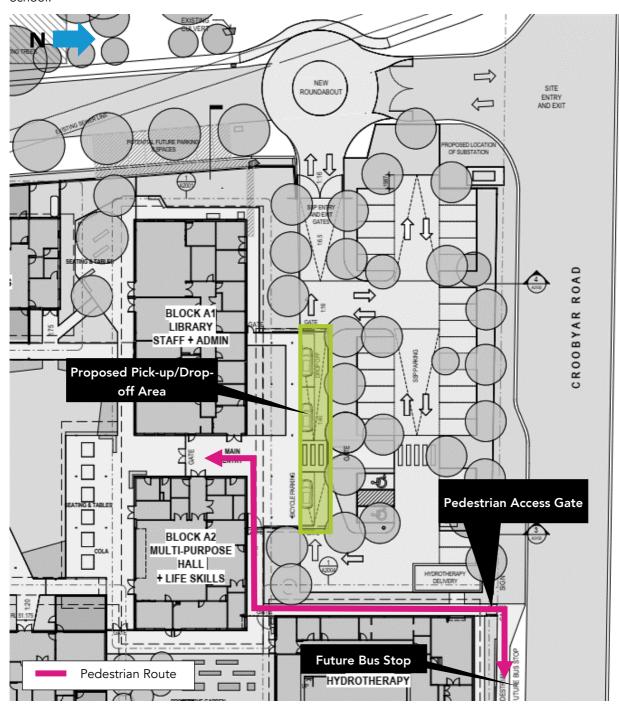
Proposed Site Layout - Site Plan, Drawing No. A2000, Issue J (Source: GroupGSA)
